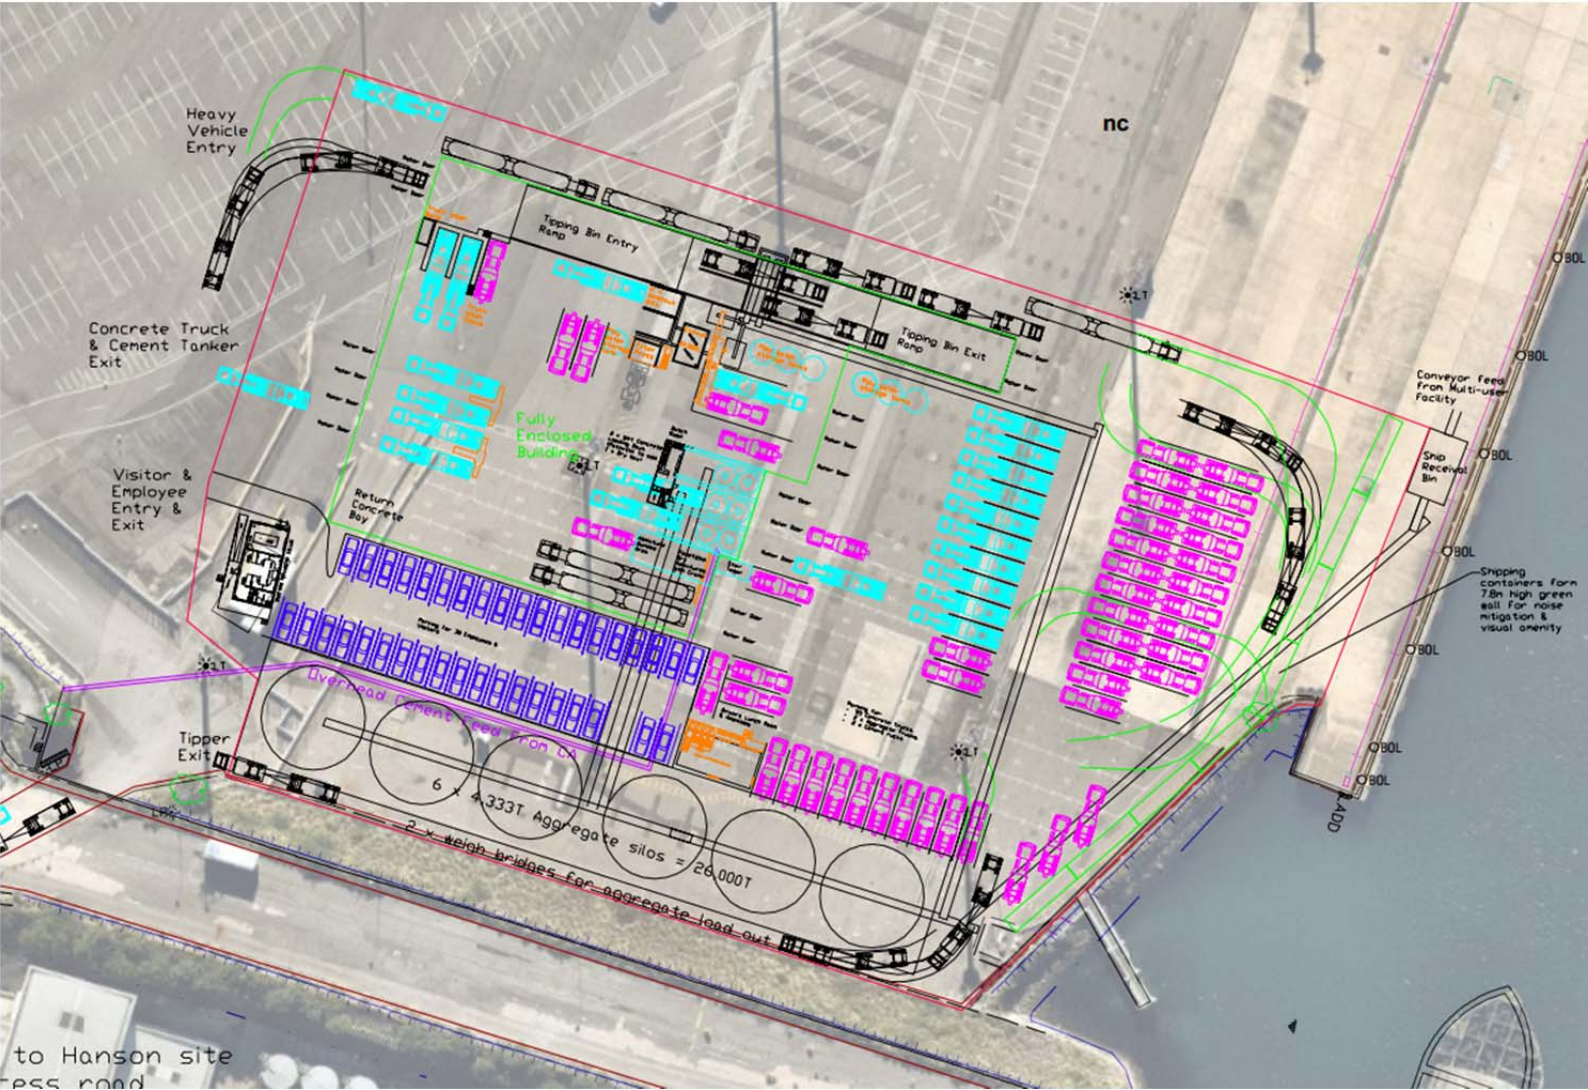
Proposed layout of Hanson concrete batching plant, Glebe Island
